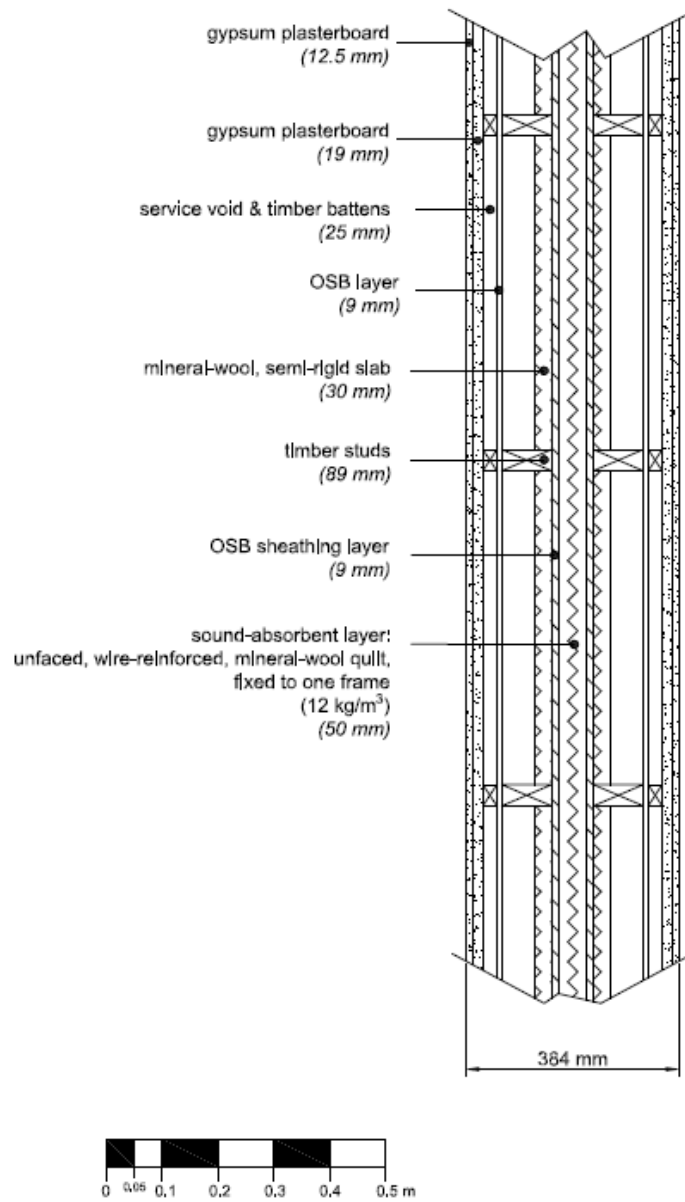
Party wall B (closed-panel timber frame), horizontal section.
